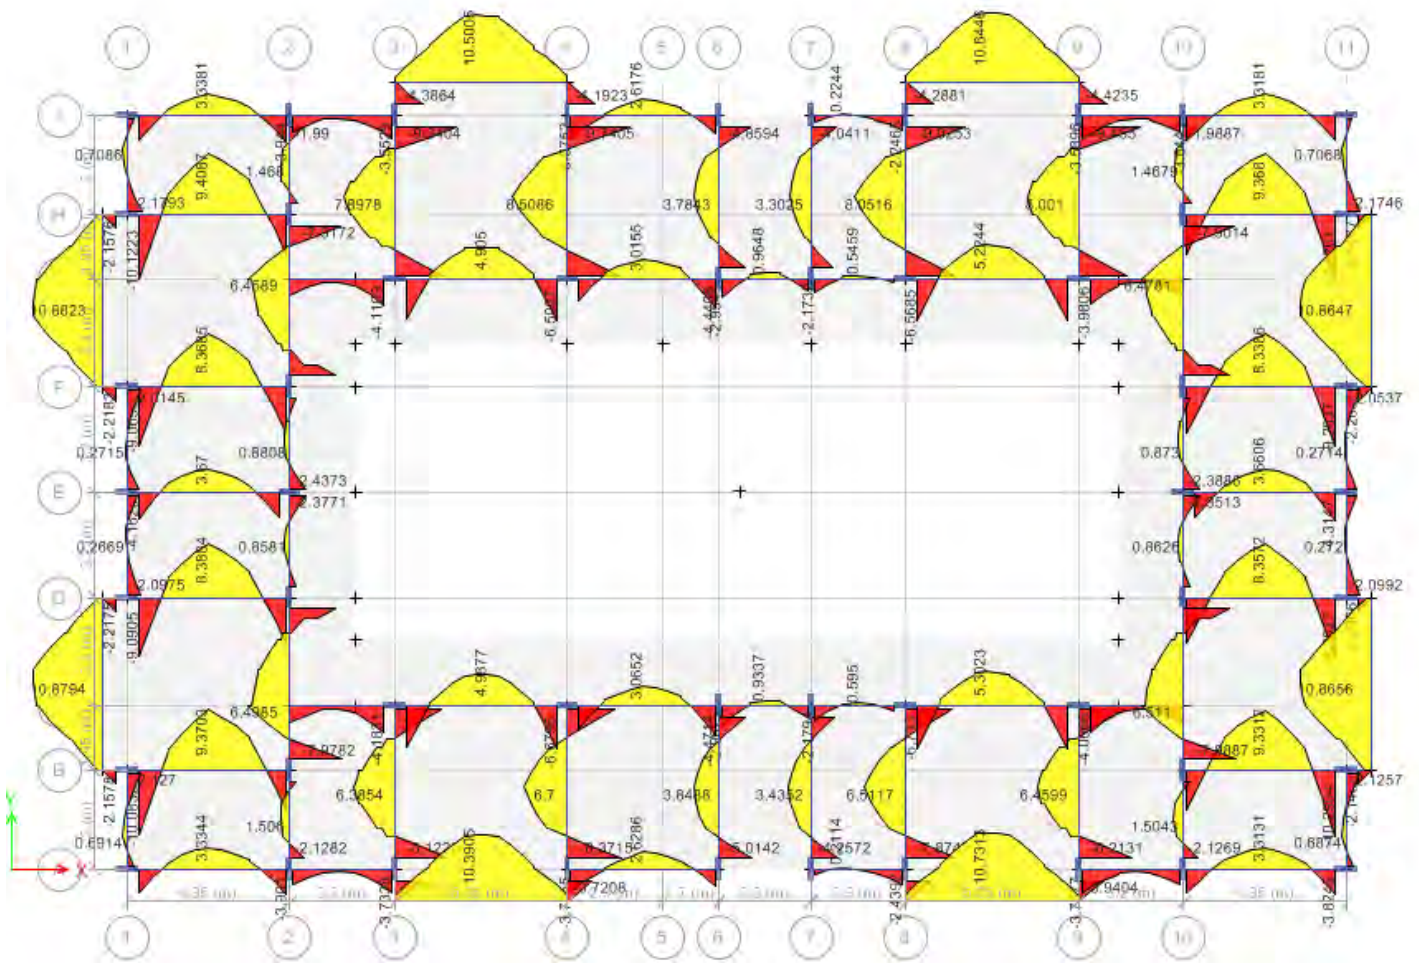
Ground Floor Beam Moment diagram (M3-t.m)
